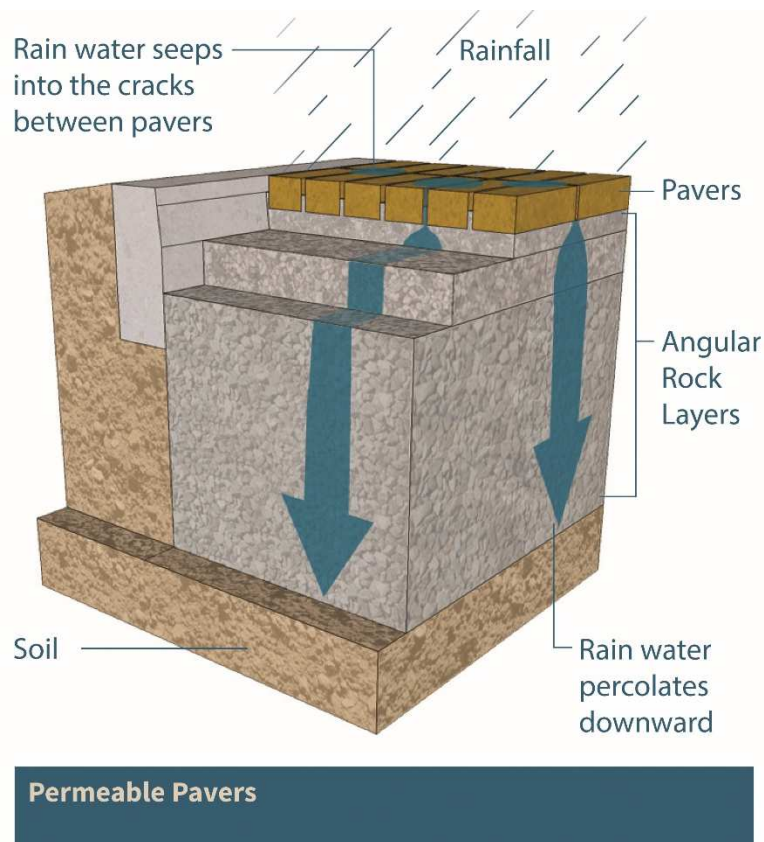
PERMEABLE PAVER SECTION DETAIL
